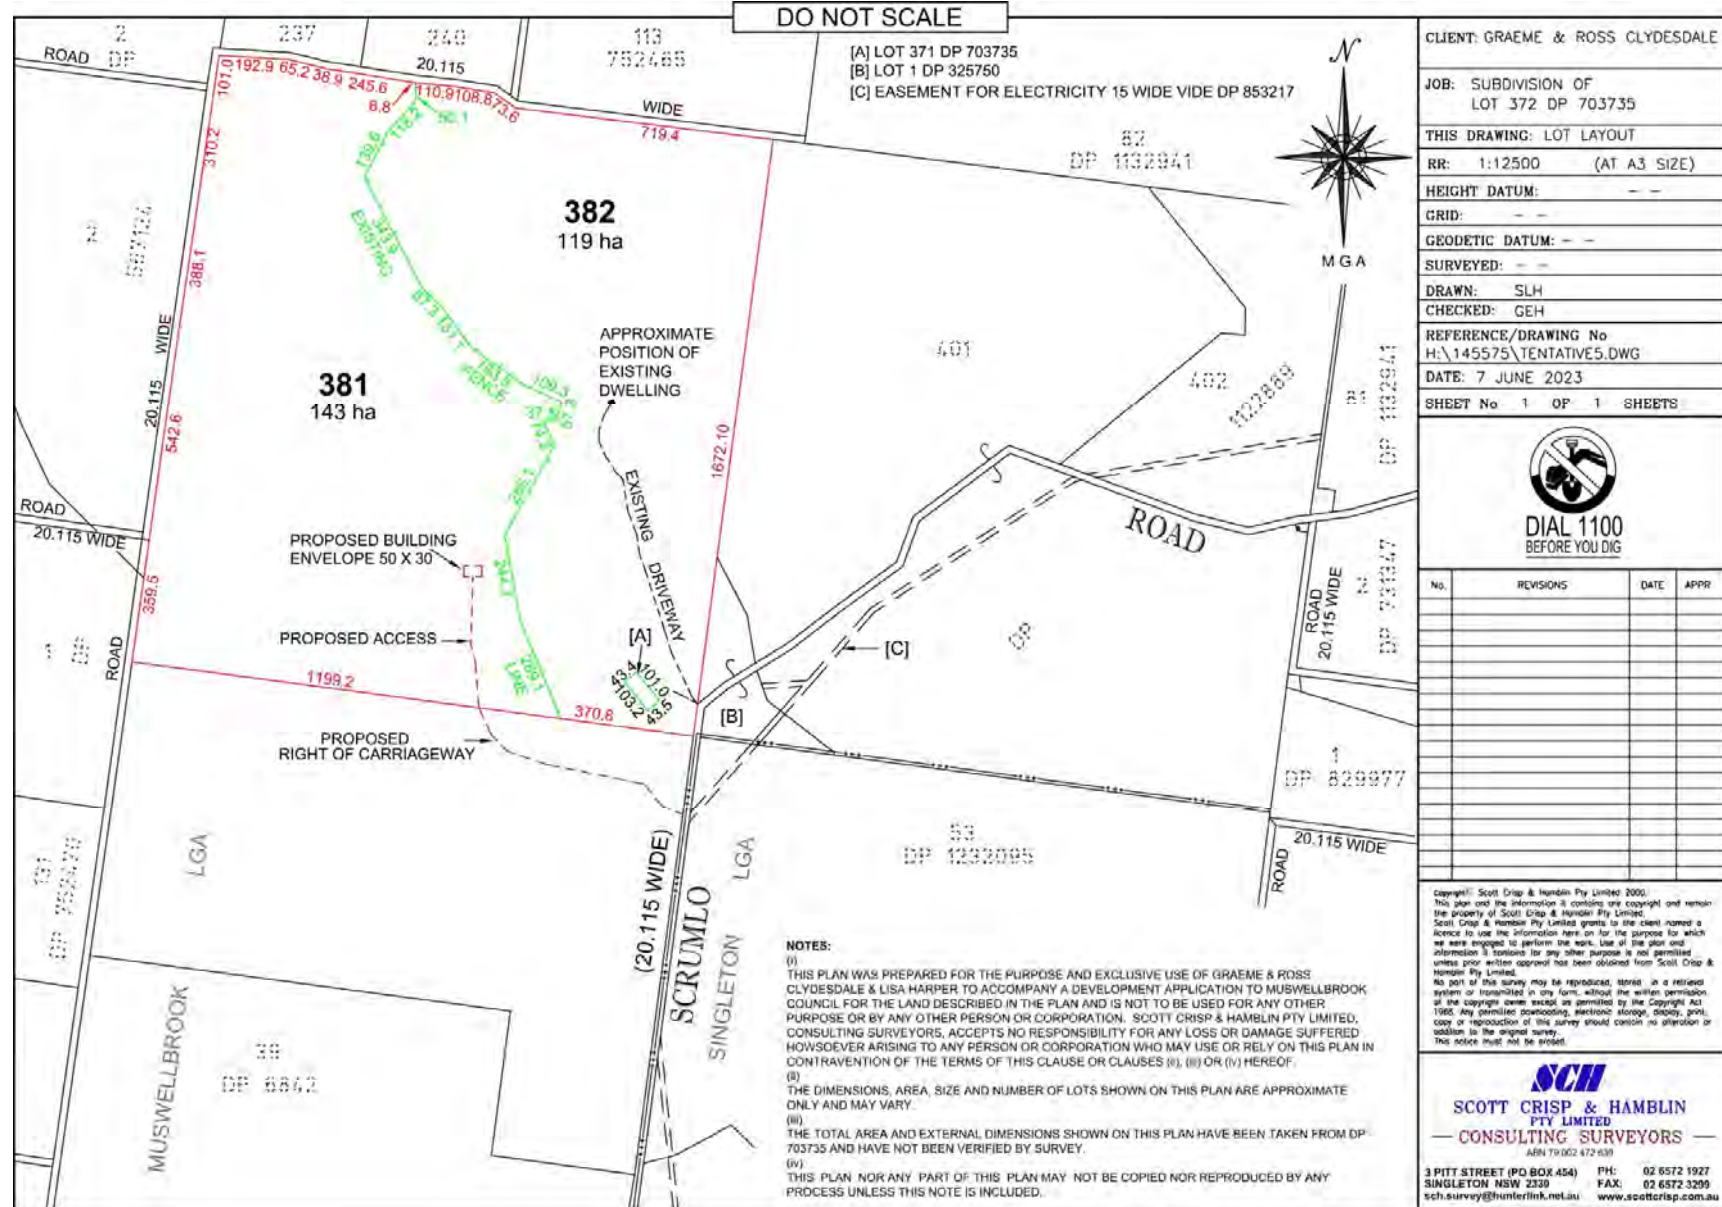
Site Map showing proposed subdivision, building envelope and access roads
